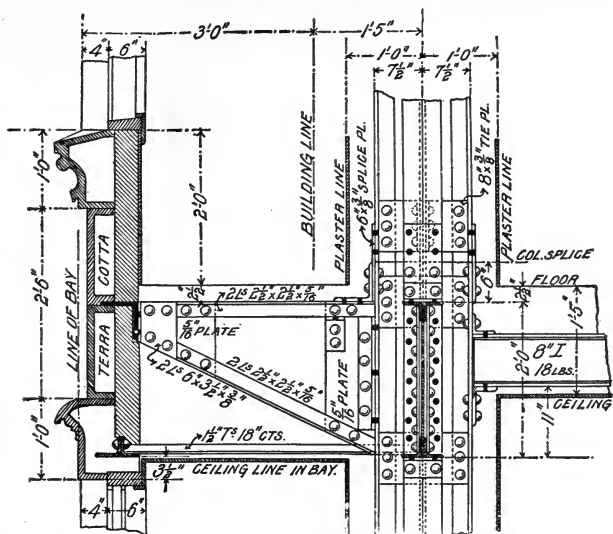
Spandrel Section through Centre of Bay Window. Reliance Building.
